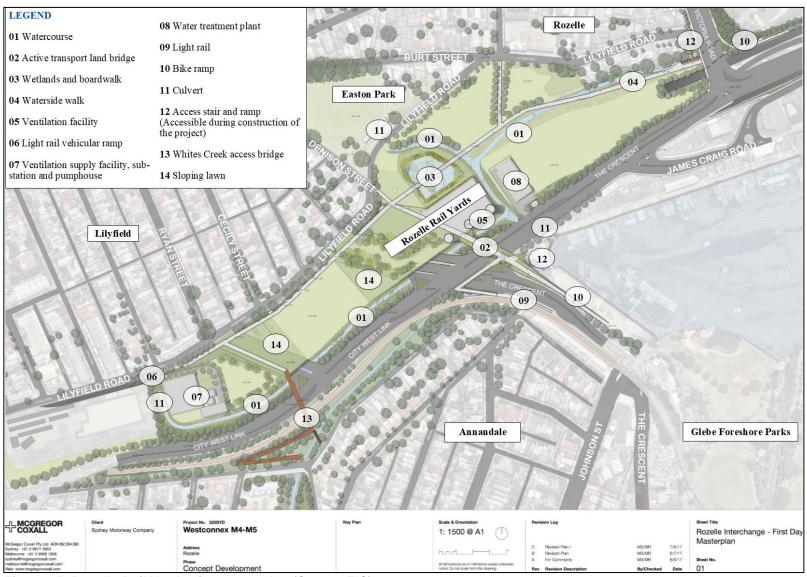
Rozelle Rail Yards site masterplan (Source: EIS)
